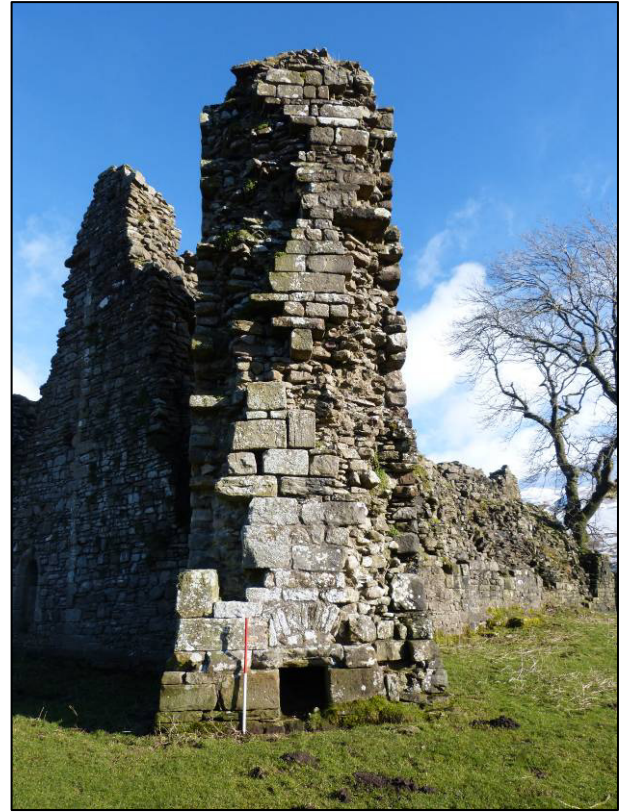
Pendragon Castle, south-west garderobe tower, looking NE (photo 9/582).
